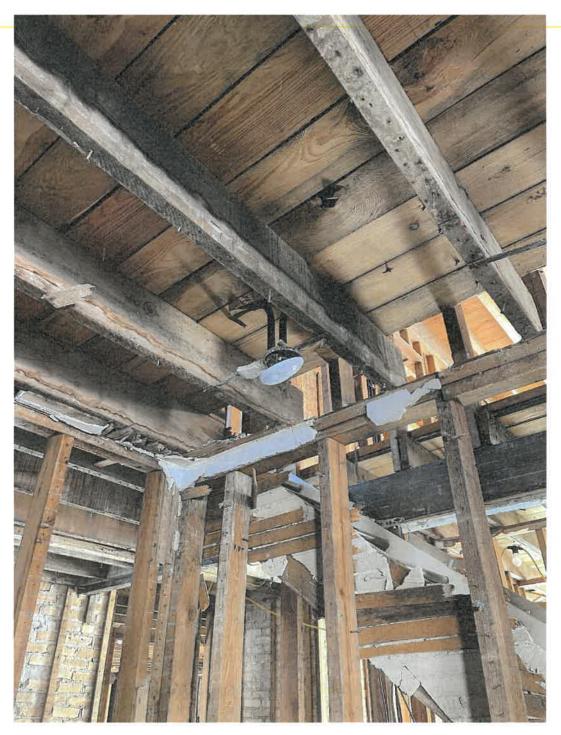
North & East Wing (First Floor) – Wood floor/ceiling joists bouncy & not level. Wood framing members stained indicating moisture damage and possible mold. Timber beam vertically unsupported.
